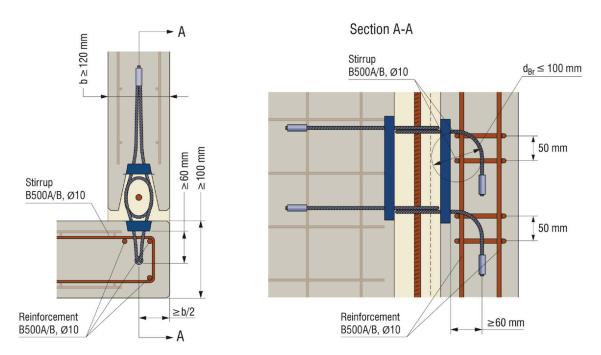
Wall - Wall - CORNER CONNECTION - detail with bended wire loops
